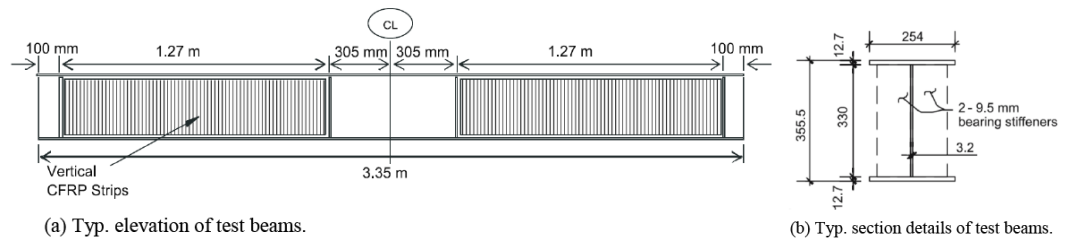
Typical details of test beams, (Patnaik and Bauer, 2004).
